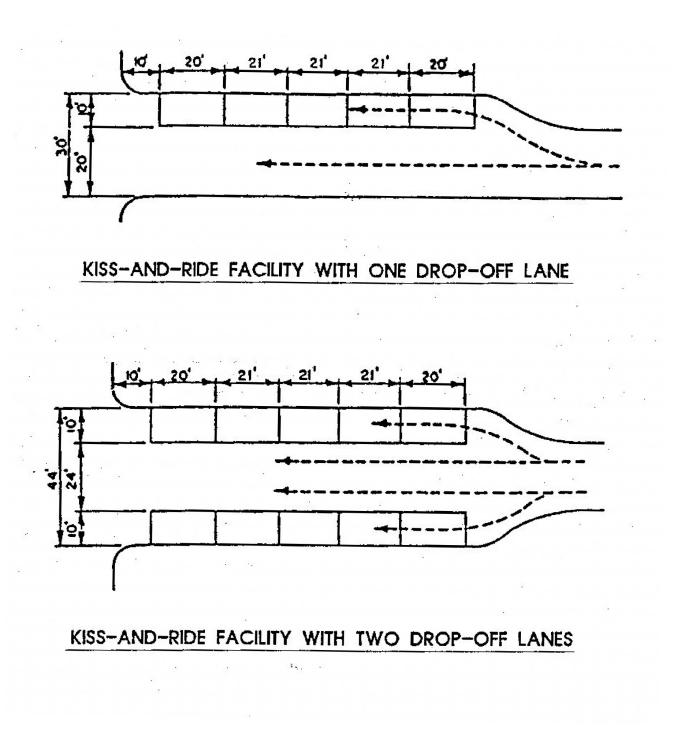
Kiss-and-Ride Parking Arrangement Stall Layout Parallel to Curb
